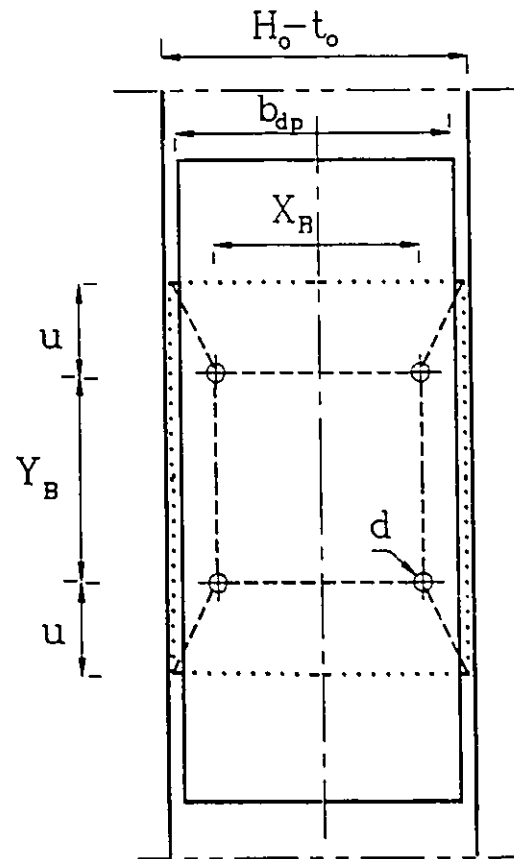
Yield line mechanism for HSS column flange stiffened with a doubler plate
